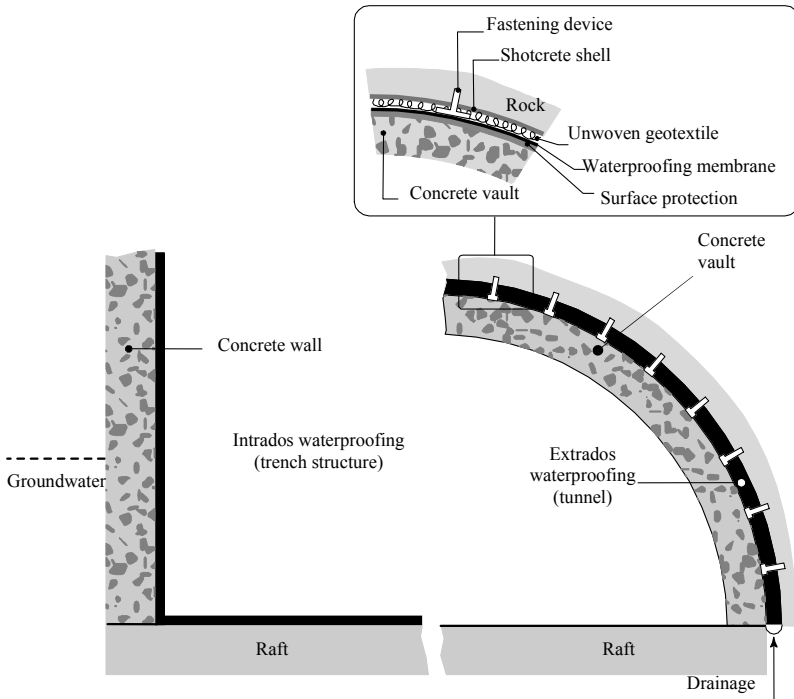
Intrados waterproofing and extrados waterproofing
